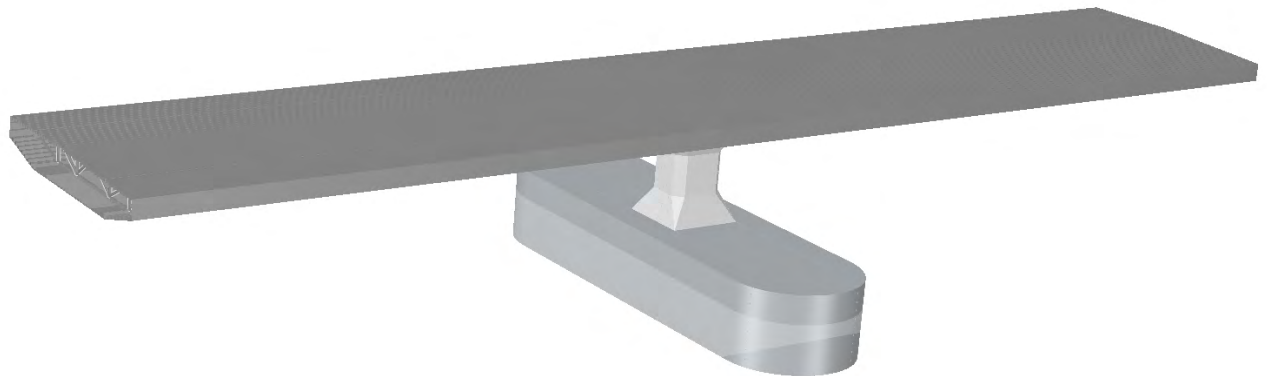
Typical floating bridge at lower part showing bridge girder, column and pontoon
